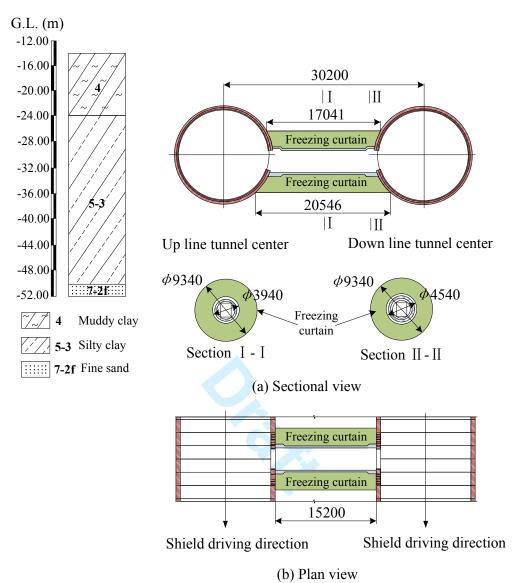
Sectional and plan view of cross passage for Shanghai Yangtze River Tunnel
